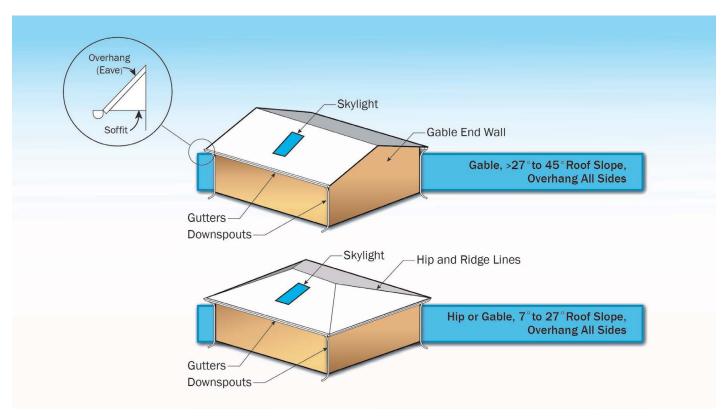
Basic elements of typical sloped roofs featuring gable-end roof system (top) and hip roof system (bottom).
